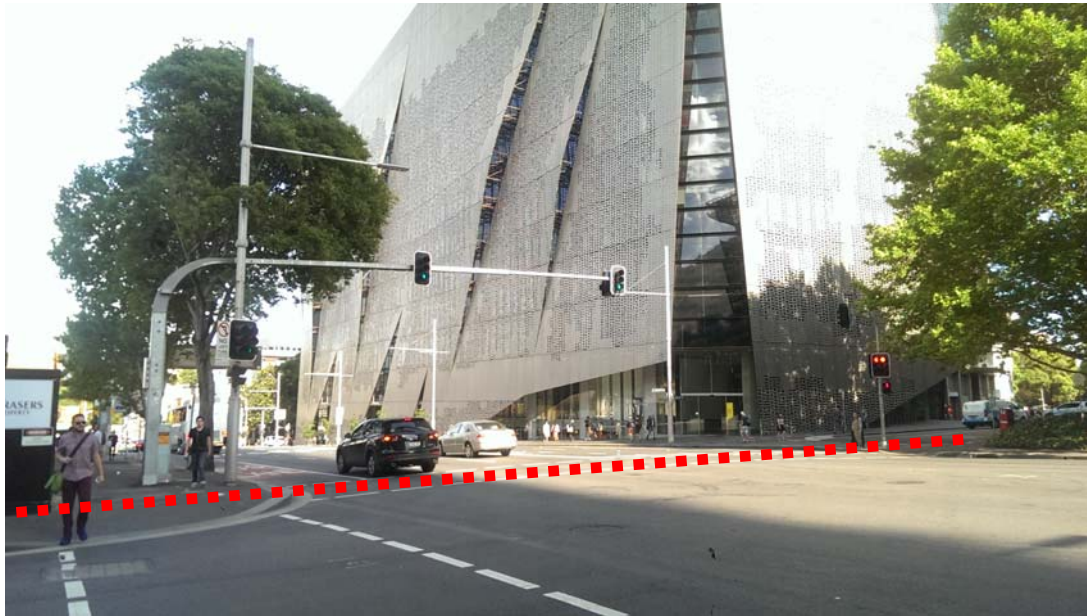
The general location of the proposed works (to be constructed underground). Looking west on Broadway.
